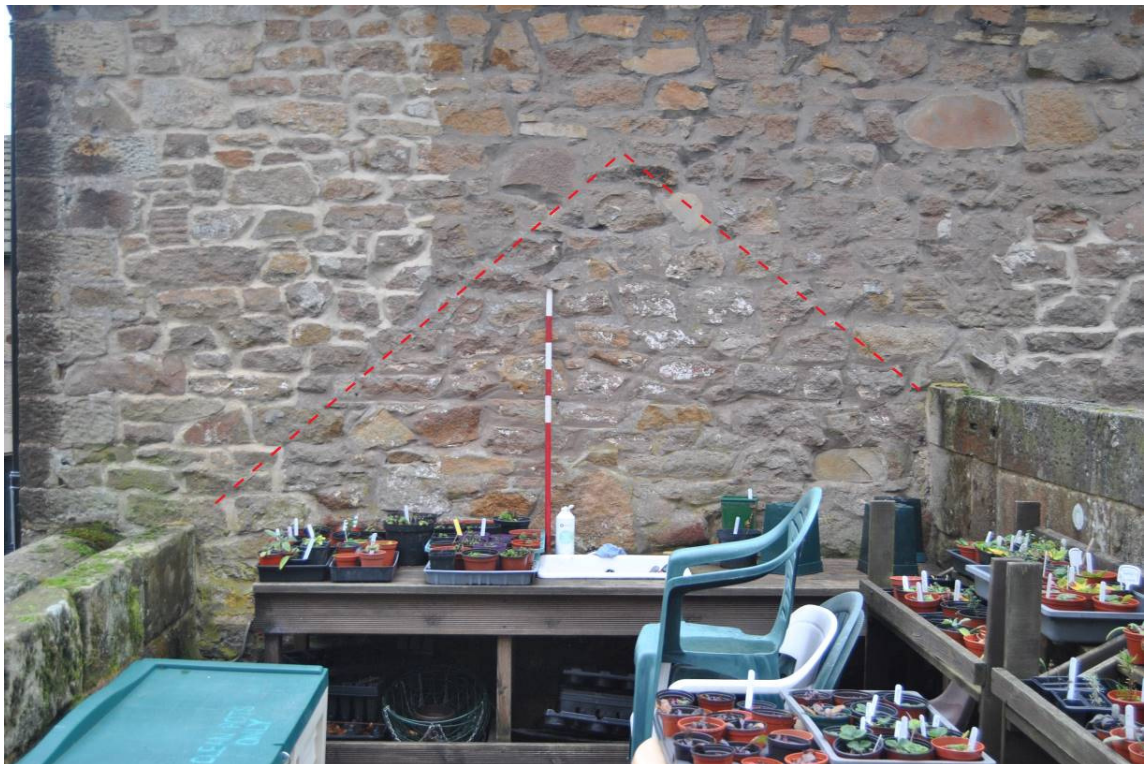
Scar of former greenhouse roof (dashed line) – see Figure 19.
